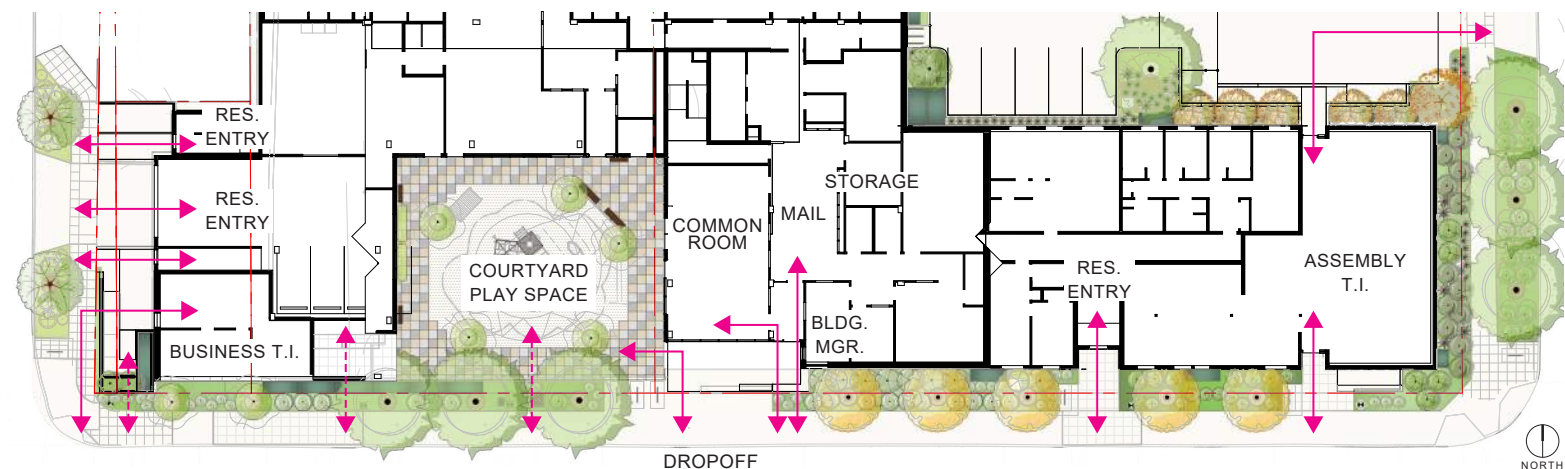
Site plan showing activity throughout site and eyes on the street. Dropoff and mail accommodations are also highlighted
